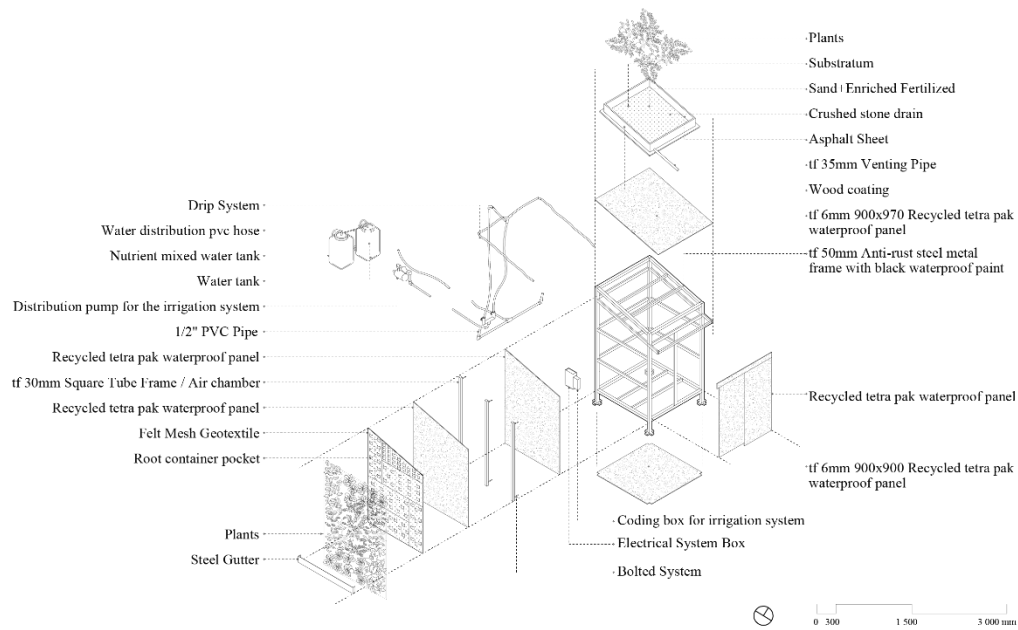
Exploded axonometric drawing of prototype 1. Drawing by Kamila Ramirez & Kristopher Buitron.
